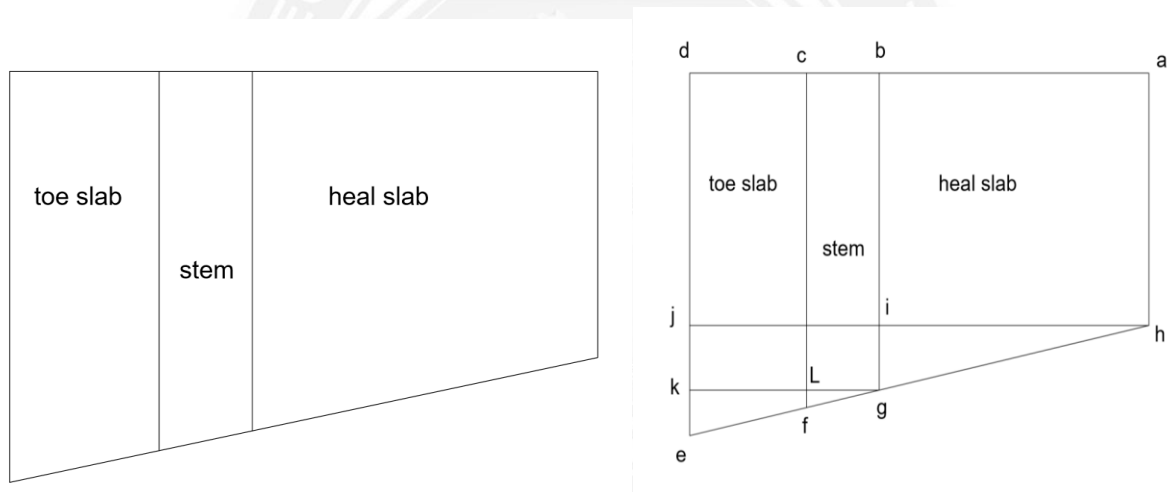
Cantilever retaining wall (Stability calculation Top view)
